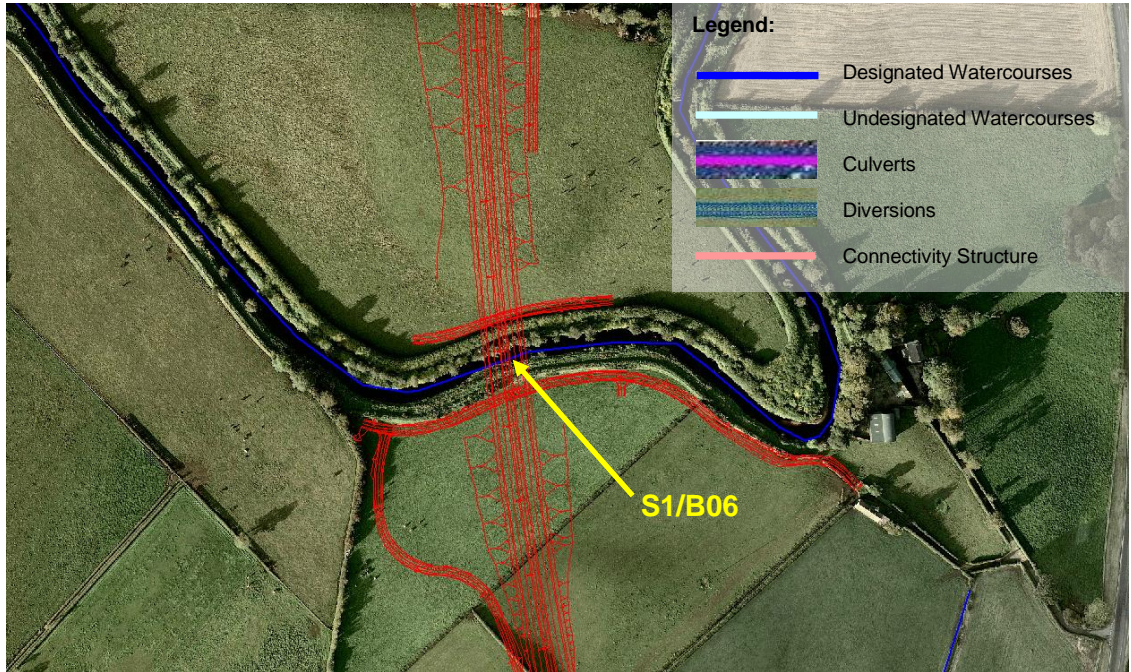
Plan of Burdennet Bridge Structure (S1/B06)
